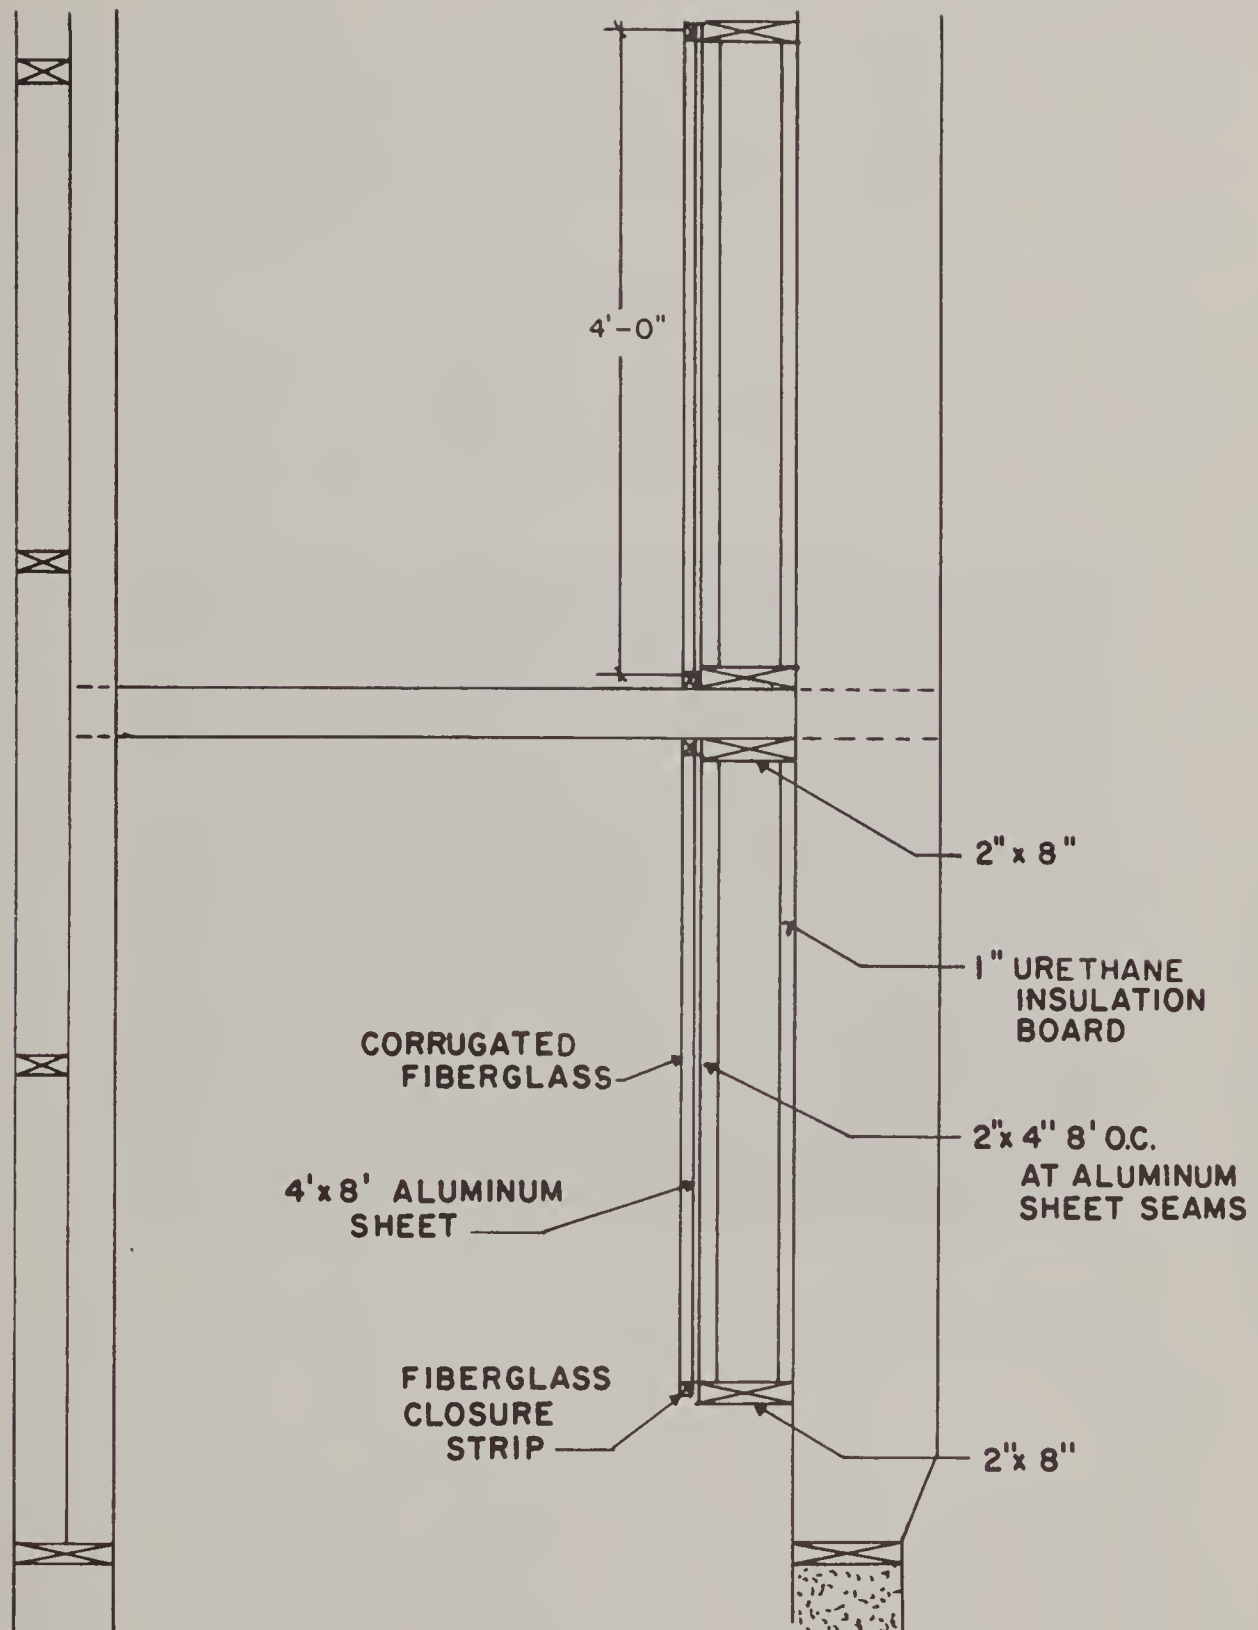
Detail of solar collector inside the south wall cavity of the solar drying building on the Vahlkamp farm.
